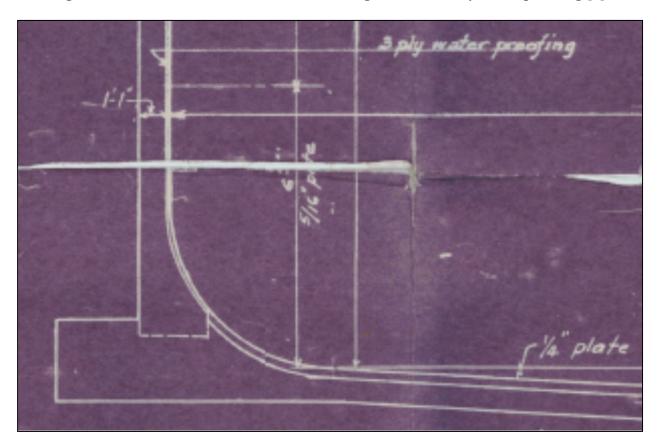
B C T U Farm Tank Knuckle Configuration w/3 Ply Waterproofing [9]
